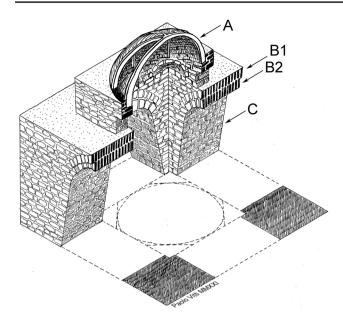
Axonometric reconstruction of the "Temple" in Neisar (Kashan, Central Iran). The stone masonry and stone vaults are mortared with gypsum. (A) gypsum ribs in the dome. (B1) Vertical stone freestanding barrel vaults composed of two overlapping arches. Vertical stone construction starts at the haunches. The stones have the same form as a fired brick. (B2) The recess on the lower barrel vault was left by a gypsum rib that served as provisional support. The vault was built from the exterior towards the interior. (C) Gypsum-mortared masonry. The pilasters taper to reduce the span of the vault
